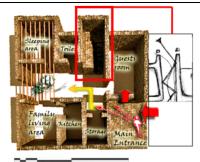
Left: Ground floor plan comprises of: L-shape entrance, guest room, storage, family living area, open roof sleeping area, toilet and a stair case leading up stairs to the bedrooms, Figure-19. Right: the stair case acting as a lighting pipe
